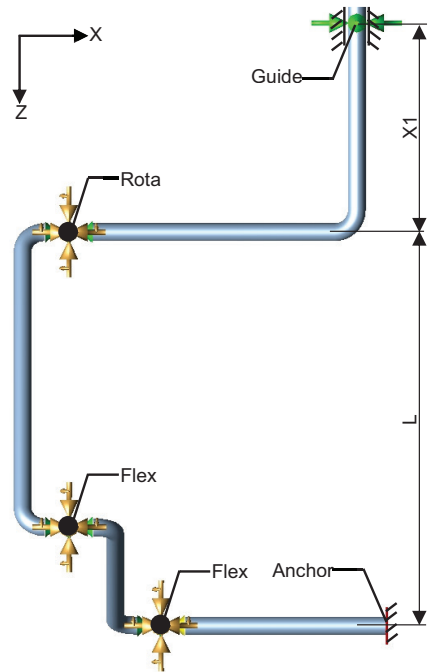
TYPICAL PIPING LAYOUT (TOP VIEW)
